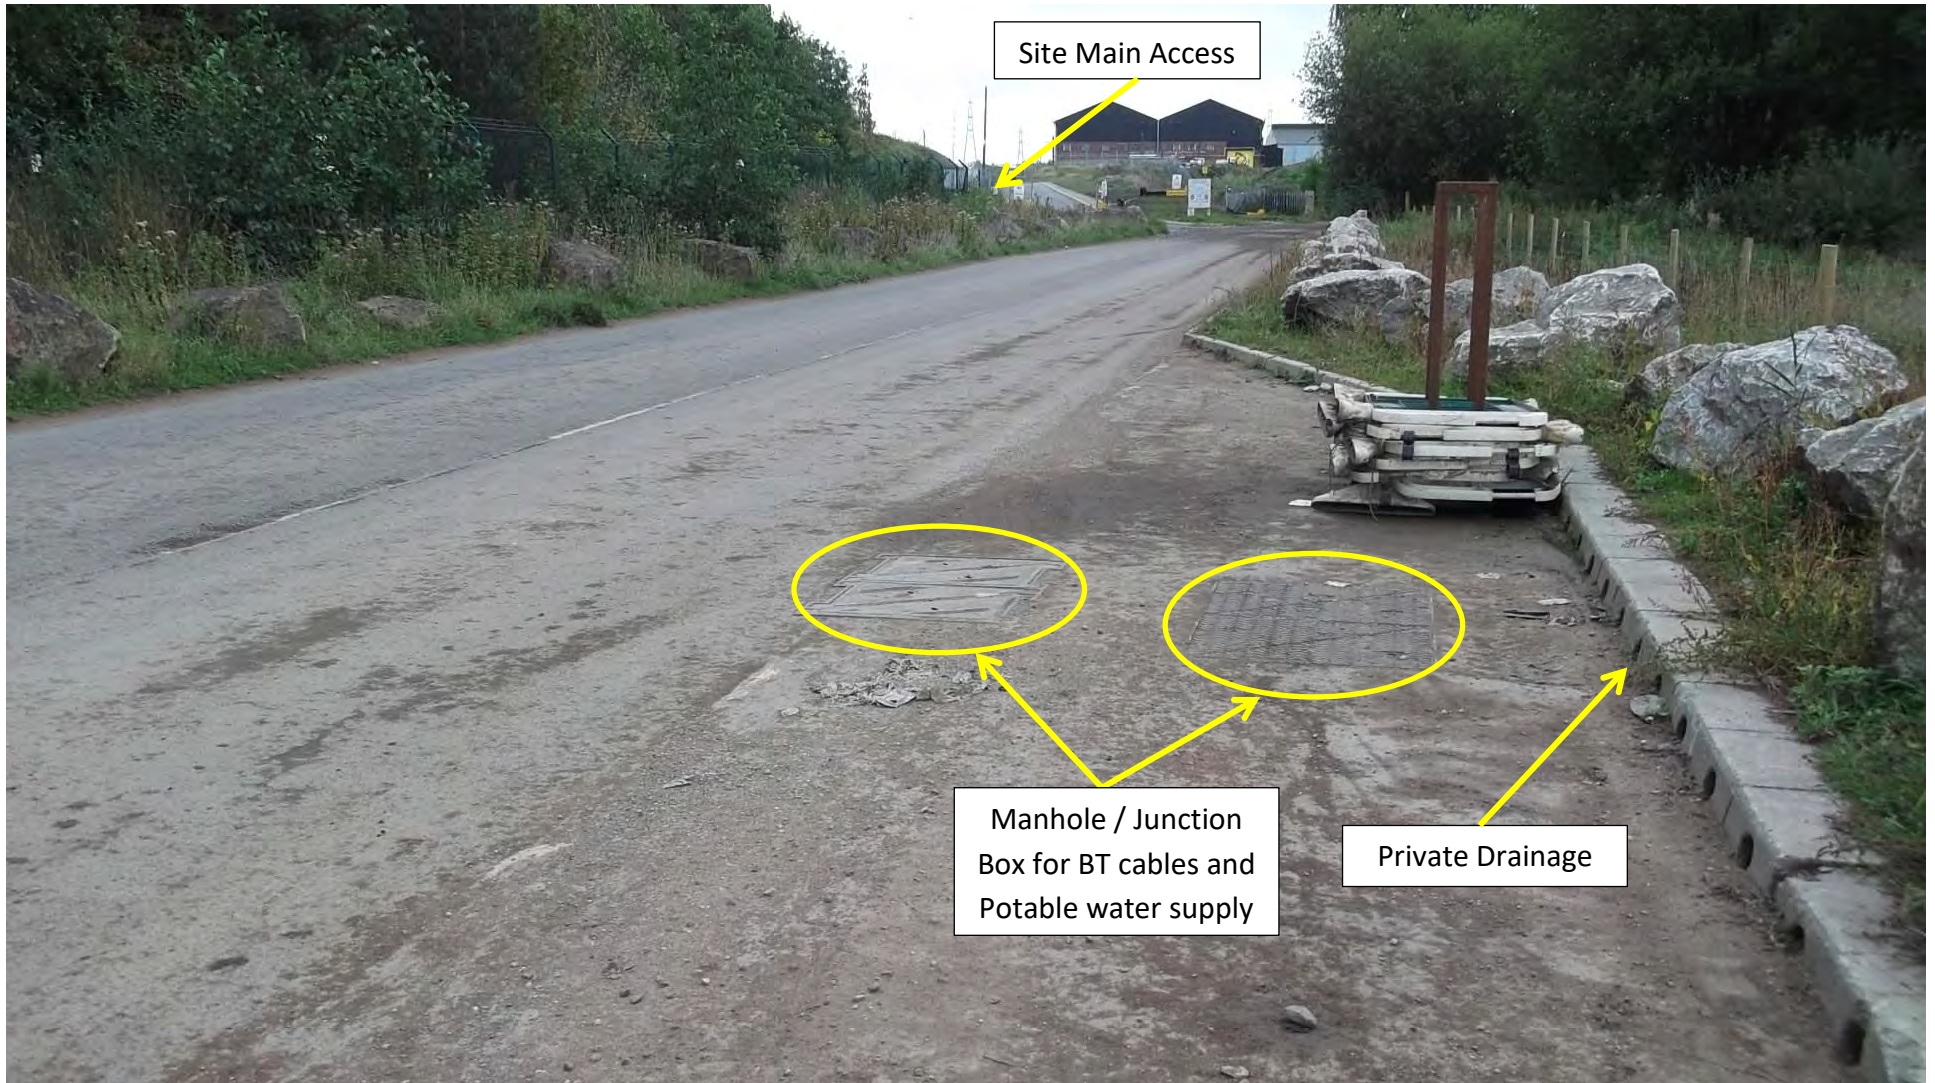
Looking northwards on to the raised area of the site, located in the south-western corner of the site.
